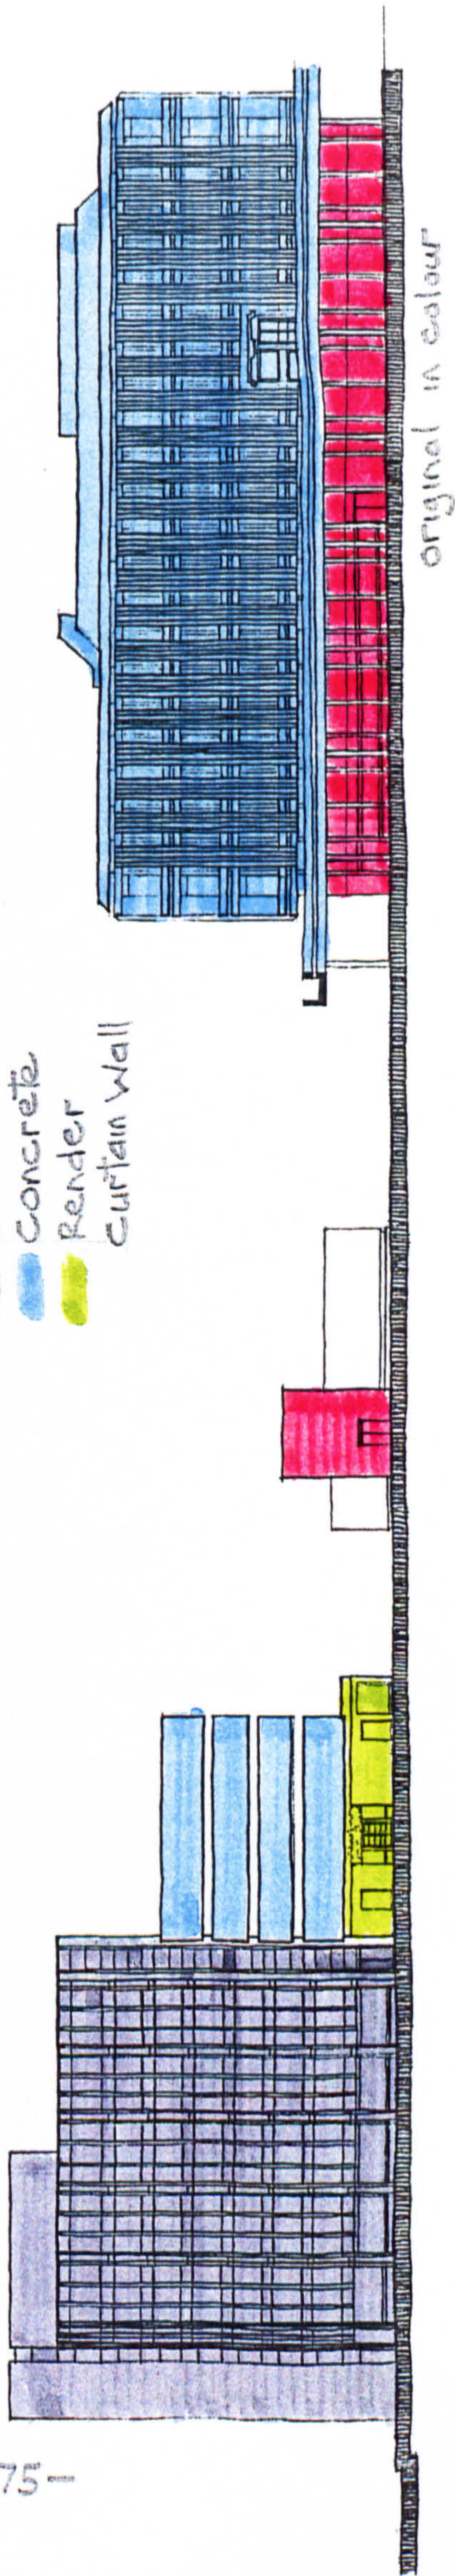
FACADE FORMS AND MATERIALS : JOHN DOBSON STREET - EAST SIDE
